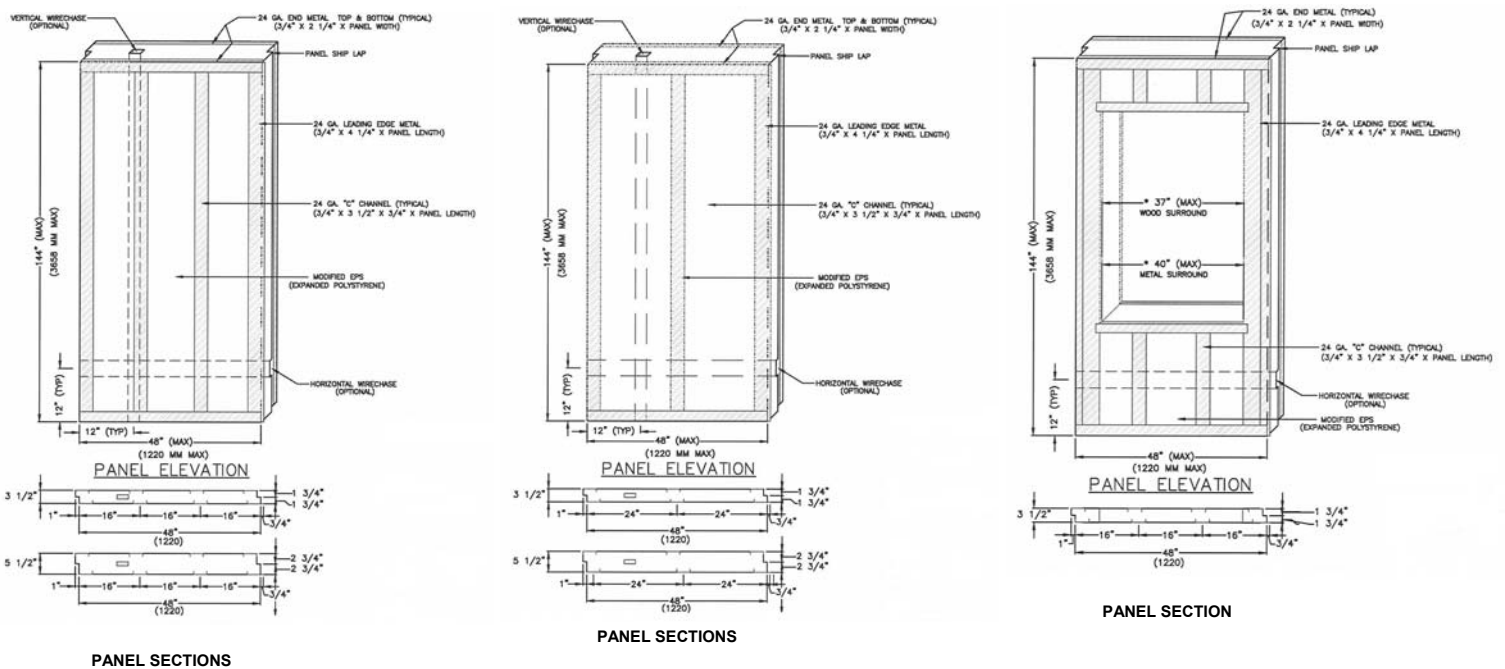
\*—THERMASTRUCTURE®/WALLFRAME™ PANELS
